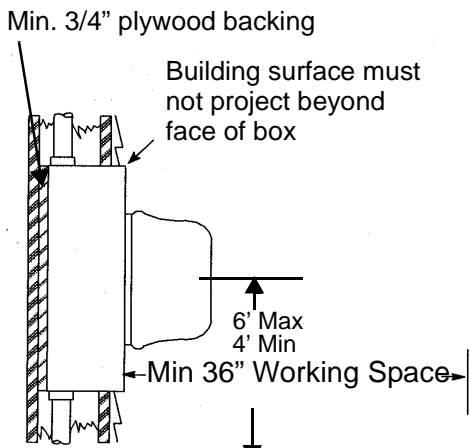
Meter Socket Clearance Requirements for Single Meter Installations
